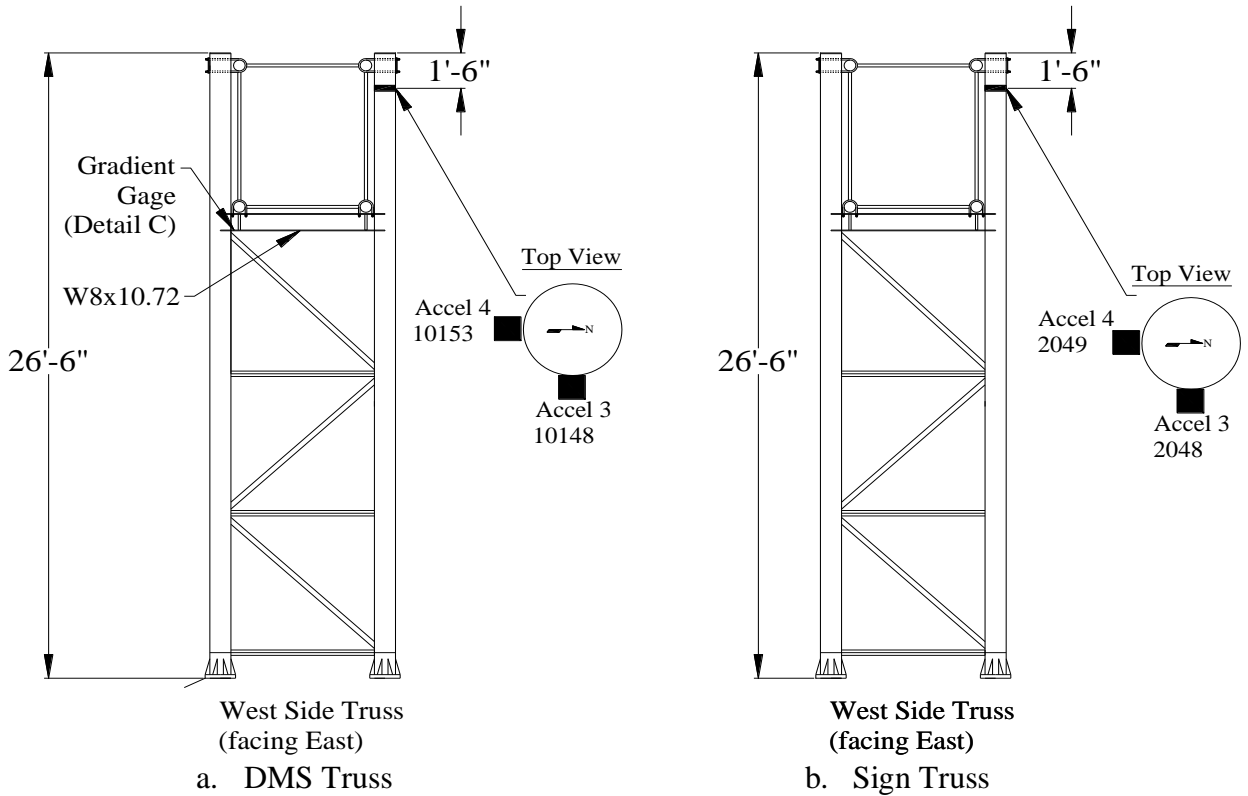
Ankeny DMS/Sign Truss instrumentation configuration on southwest support columns.
